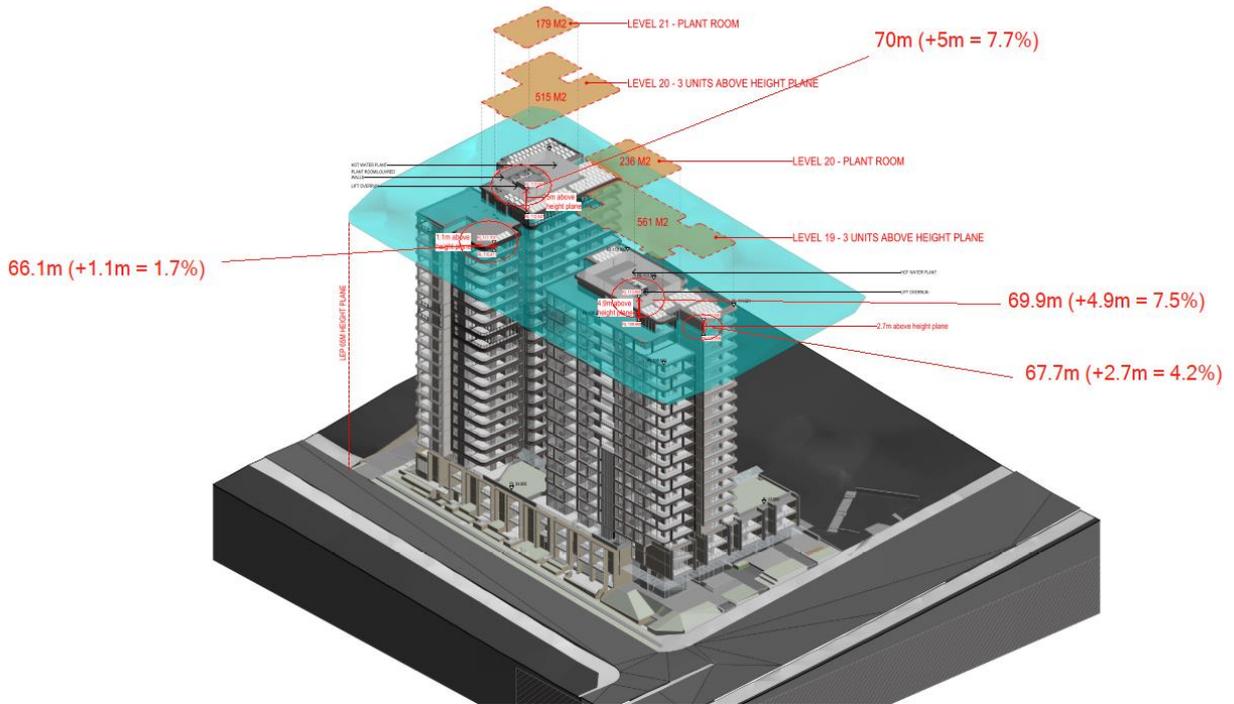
Permitted 65m height plane (in blue) as viewed from the north-east (Waterloo Road).
